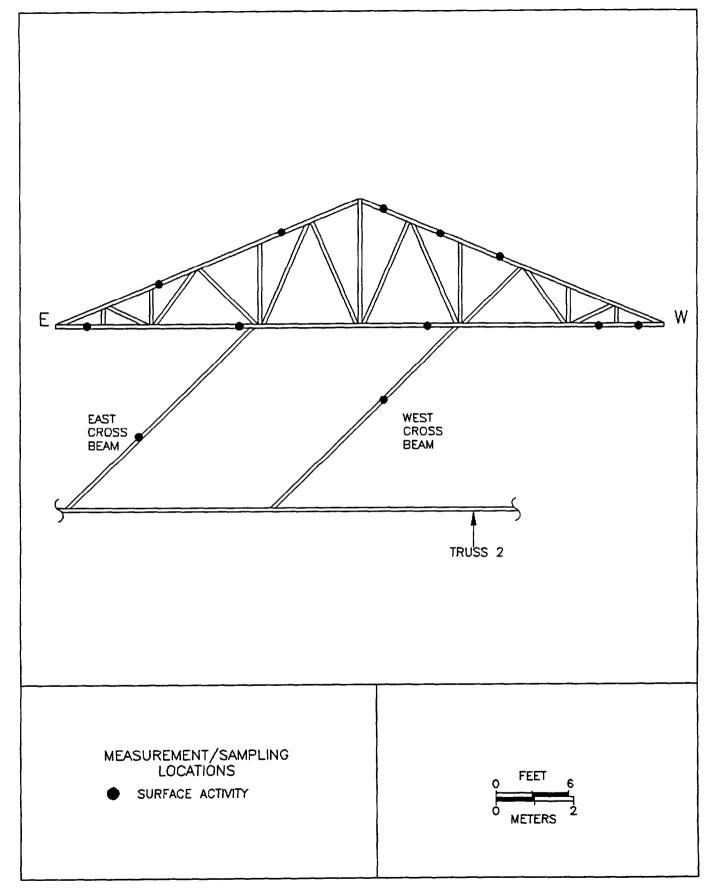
Building 3, Truss 1 — Measurement and Sampling Locations
